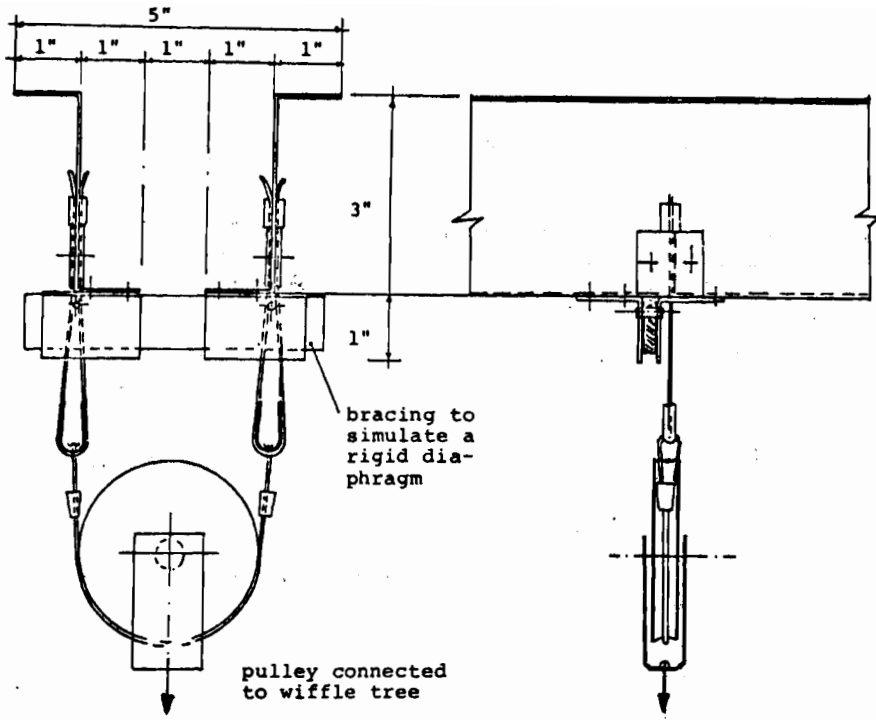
Detail showing the Load Application and Bracing Simulation in Test 4.
